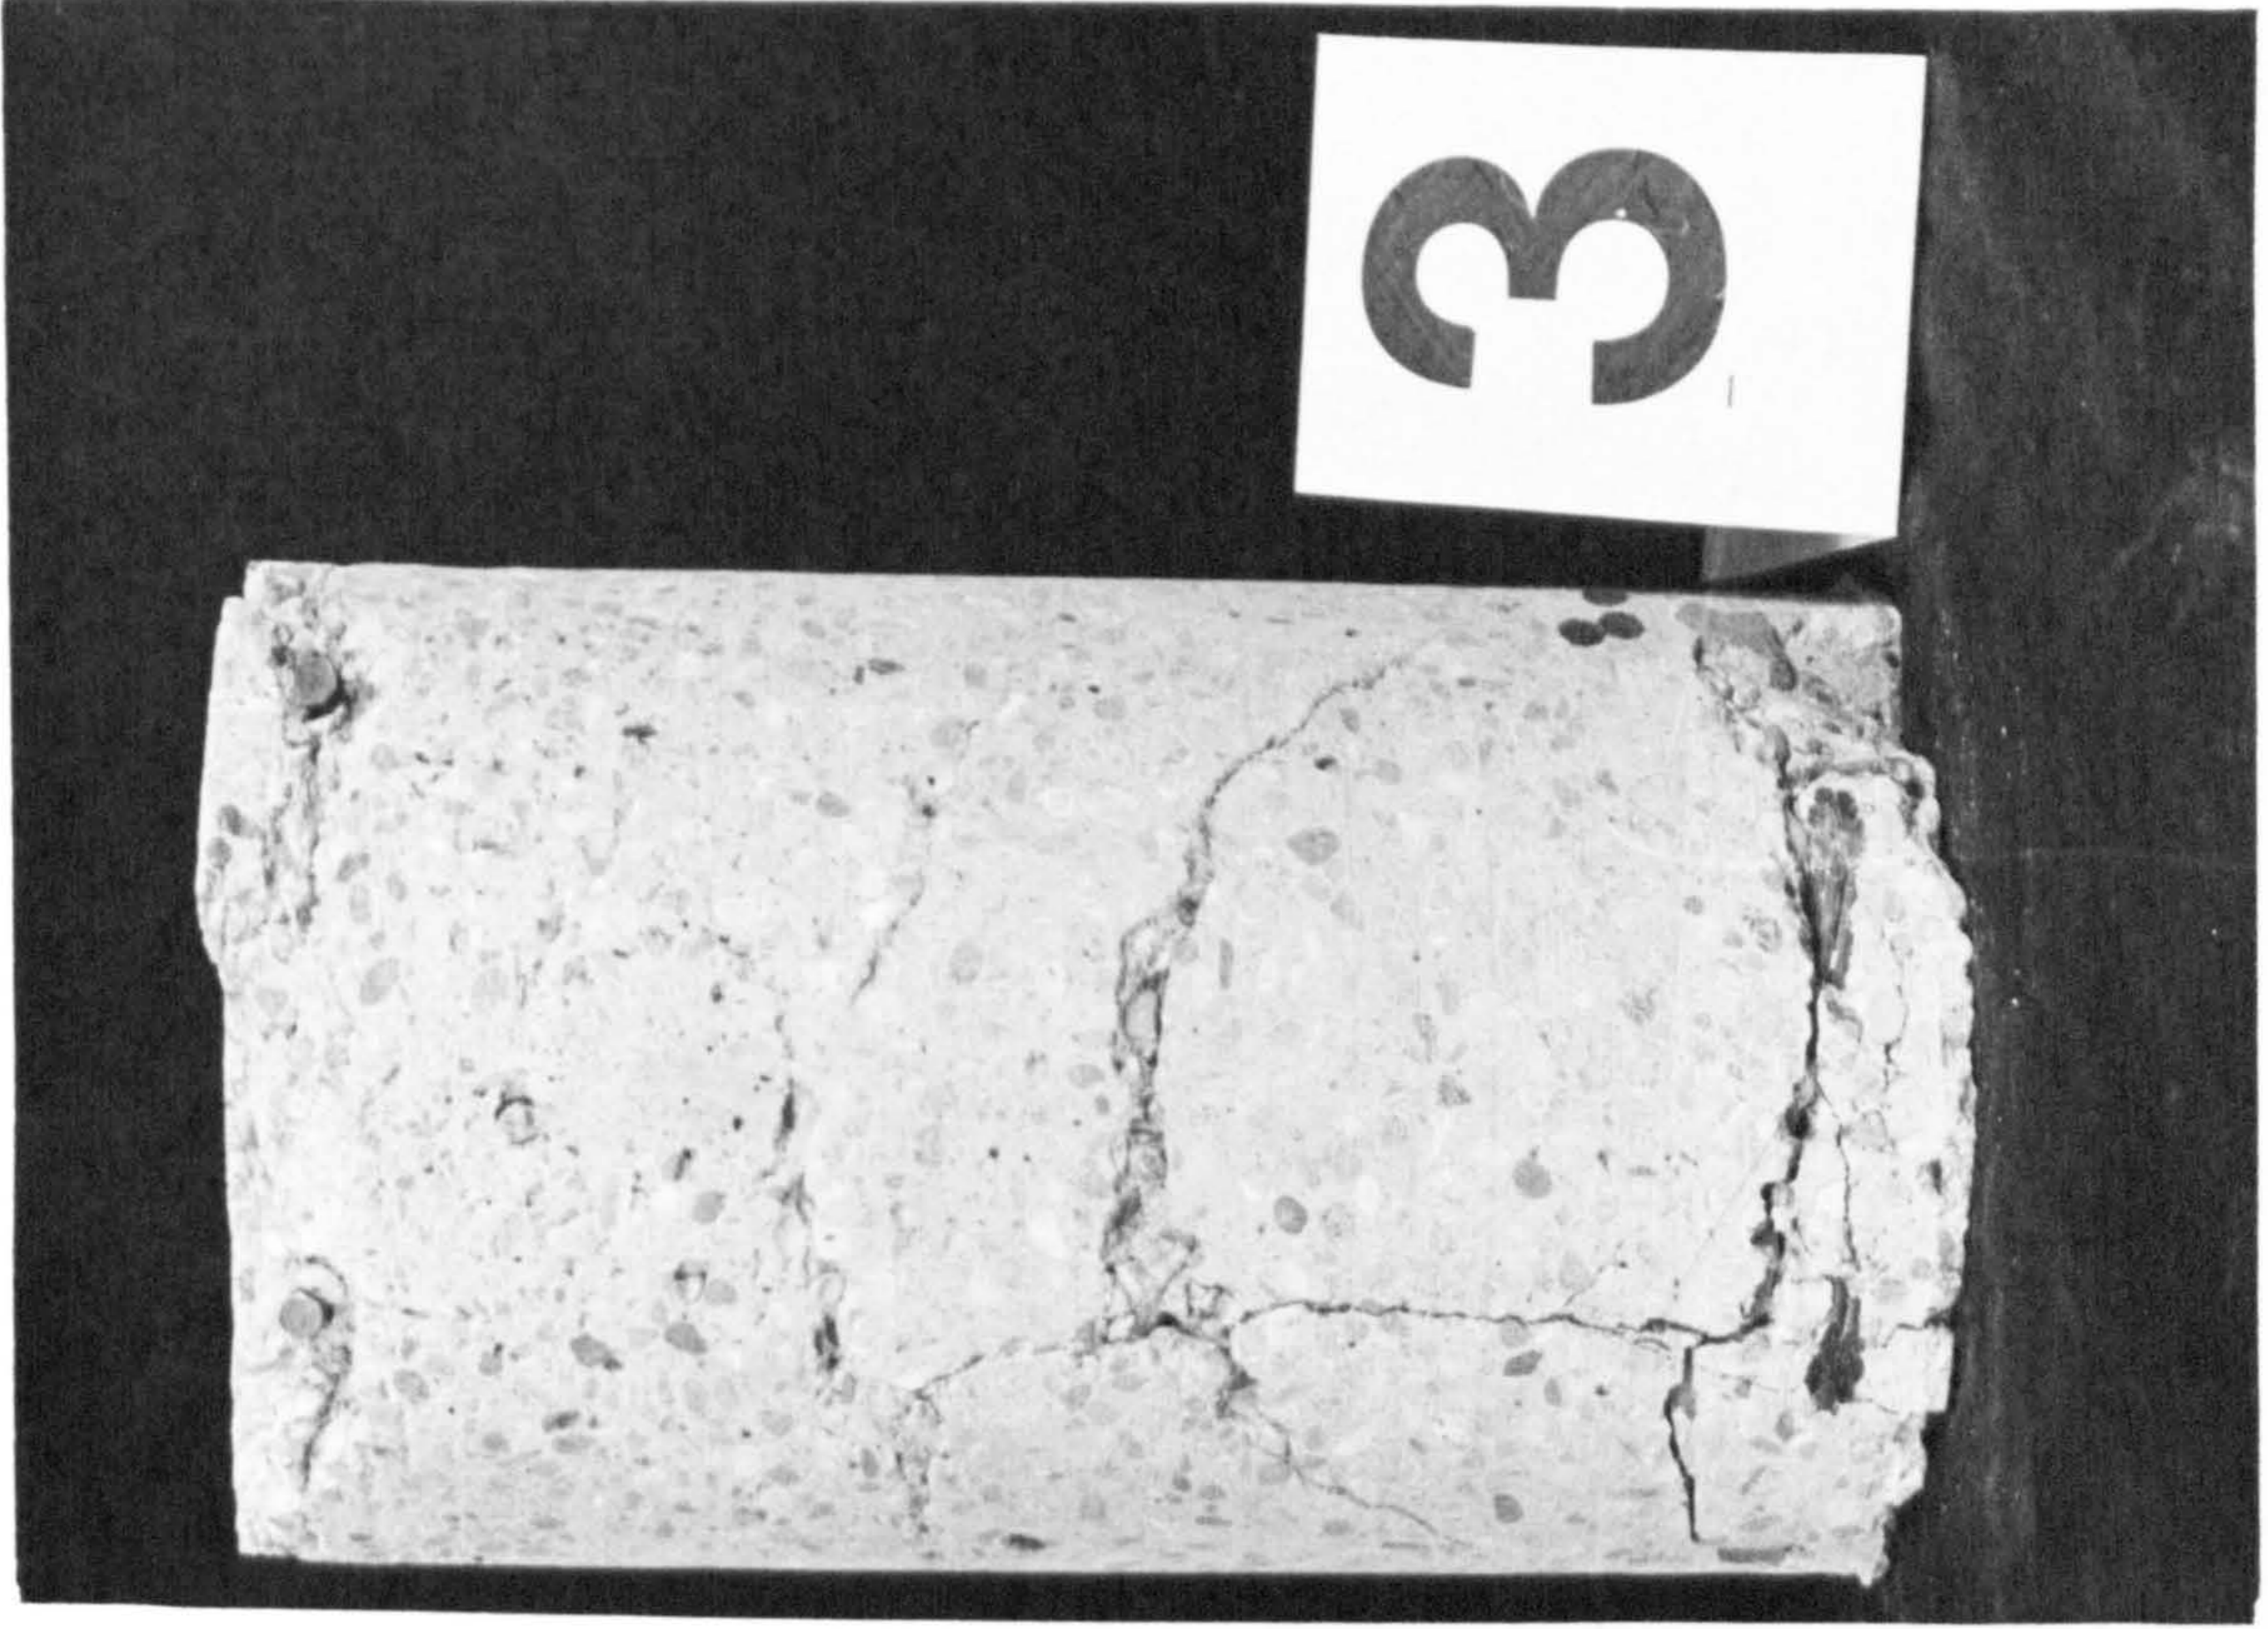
MODEL 2 SOFFIT CRACK PATTERN FOR THE OBTUSE CORNER HALF
